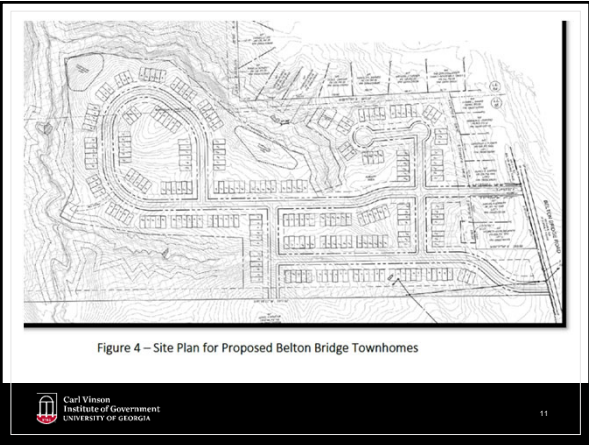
Site Plan for Proposed Belton Bridge Townhomes
